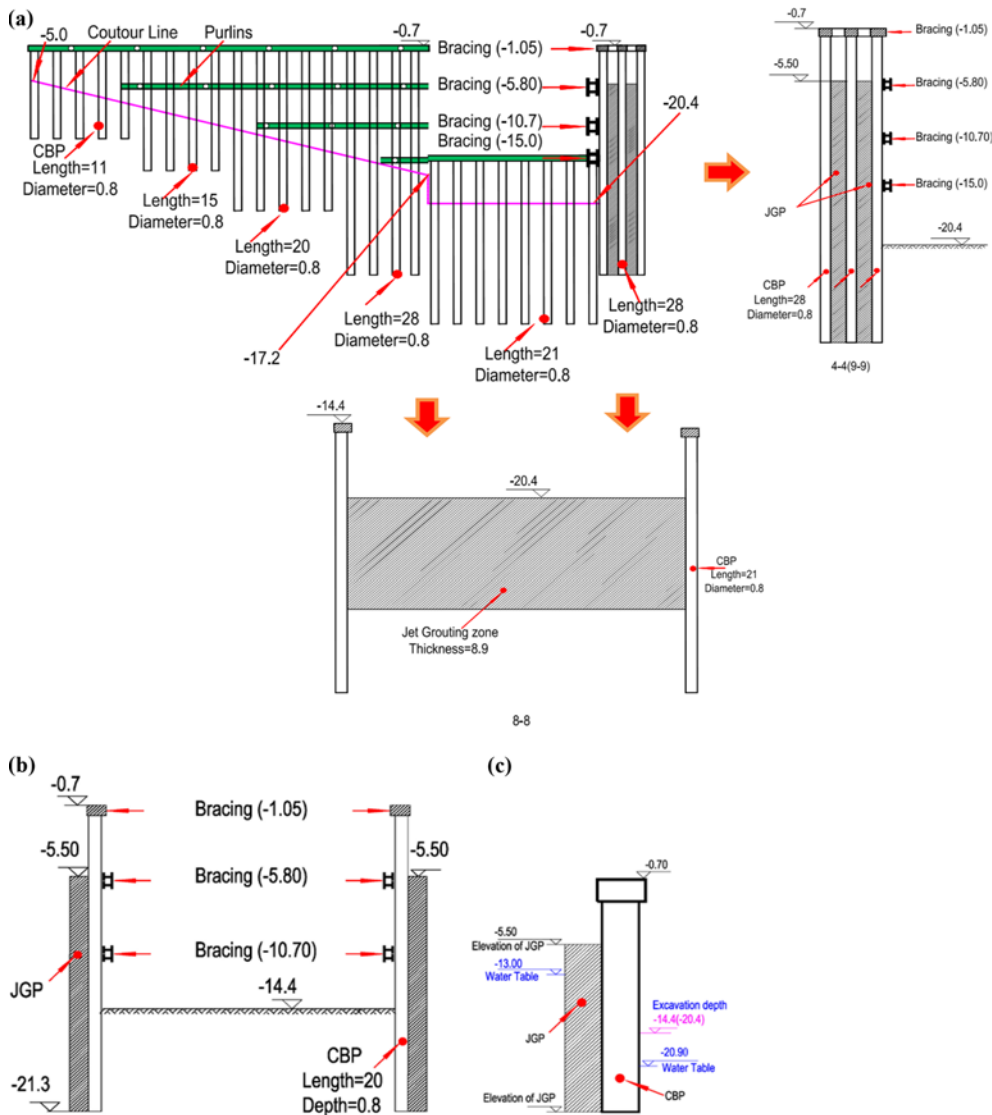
Retaining Walls: (a) Details of Middle Section: B-B, (b) Walls under Standard Section: A-A, (c) Water Table (unit: m)
